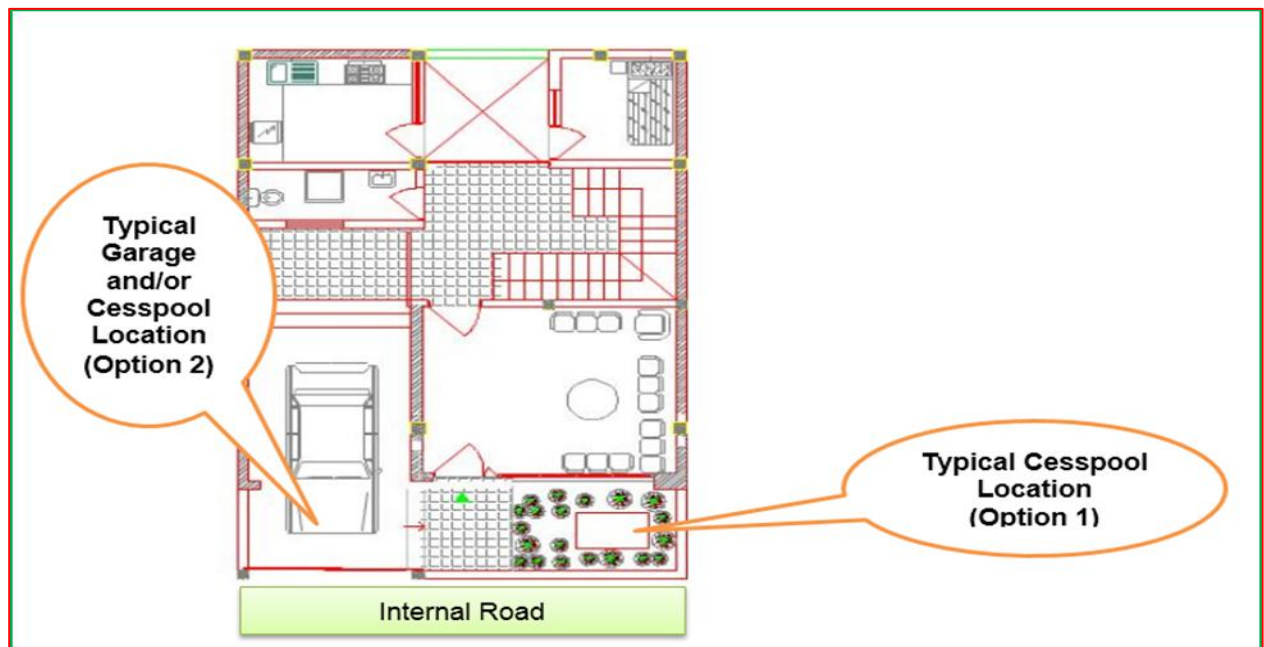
Typical ground floor plan of single family house in Tulu Dimtu area
